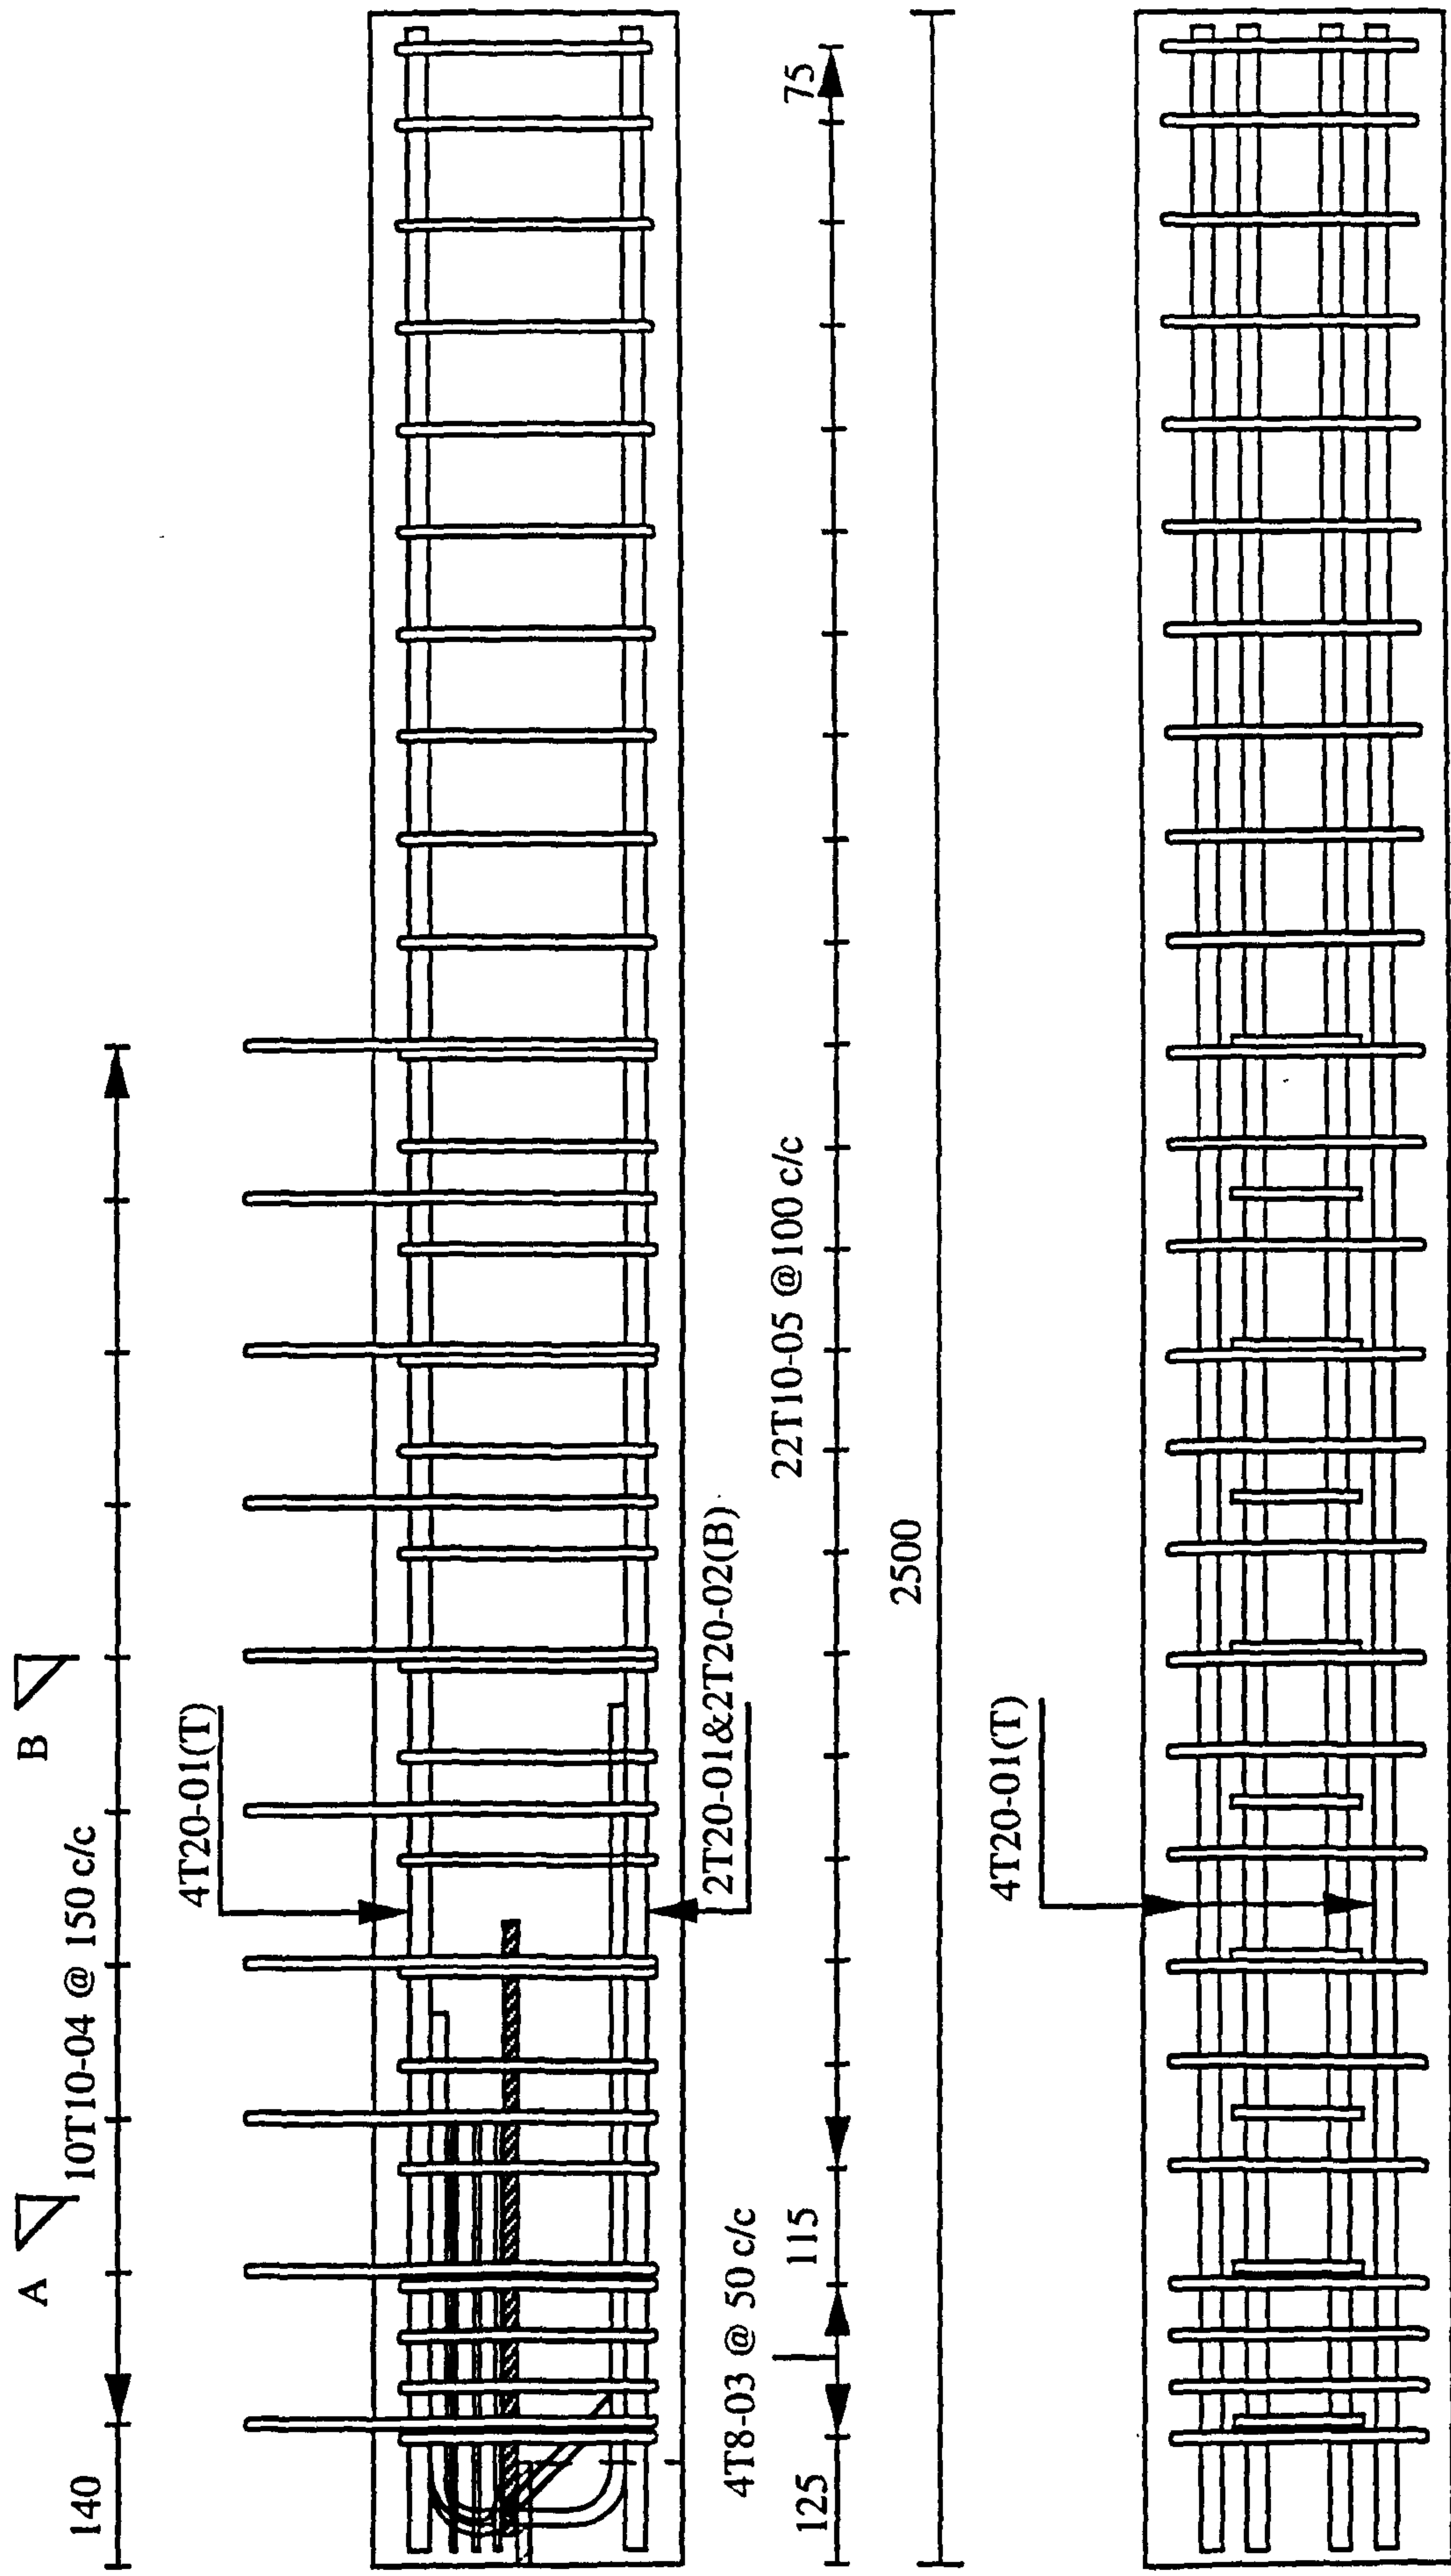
(a): Reinforcement details of beam in test series 3 and 4
